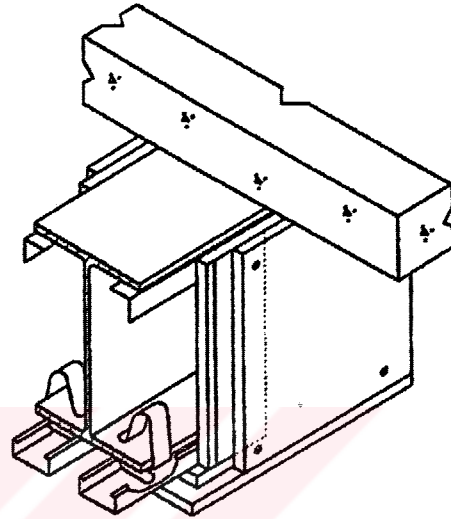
Details of frameless gypsum board encasement of steel beam and column
